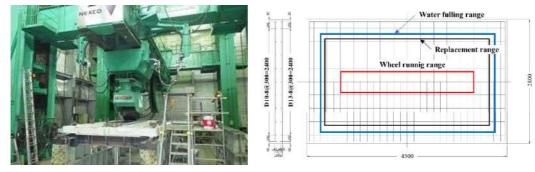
Wheel load running test and Reinforced Concrete Deck Specimen (Water Jet Repair Method)
